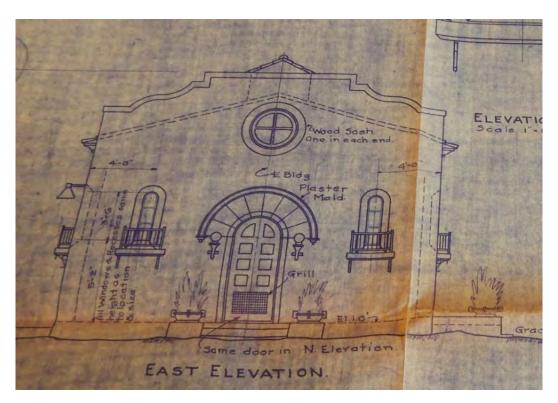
Excerpt from 1926 as-builts depicting the eastern (primary) elevation of the former substation at 498 Del Monte Avenue. The rose window has been infilled, and the sconces flanking the door have been removed. Based on inspection of an aerial from 1929 (Figure 15), the decorative planters on either side of the doorway in the as-builts never were installed.
